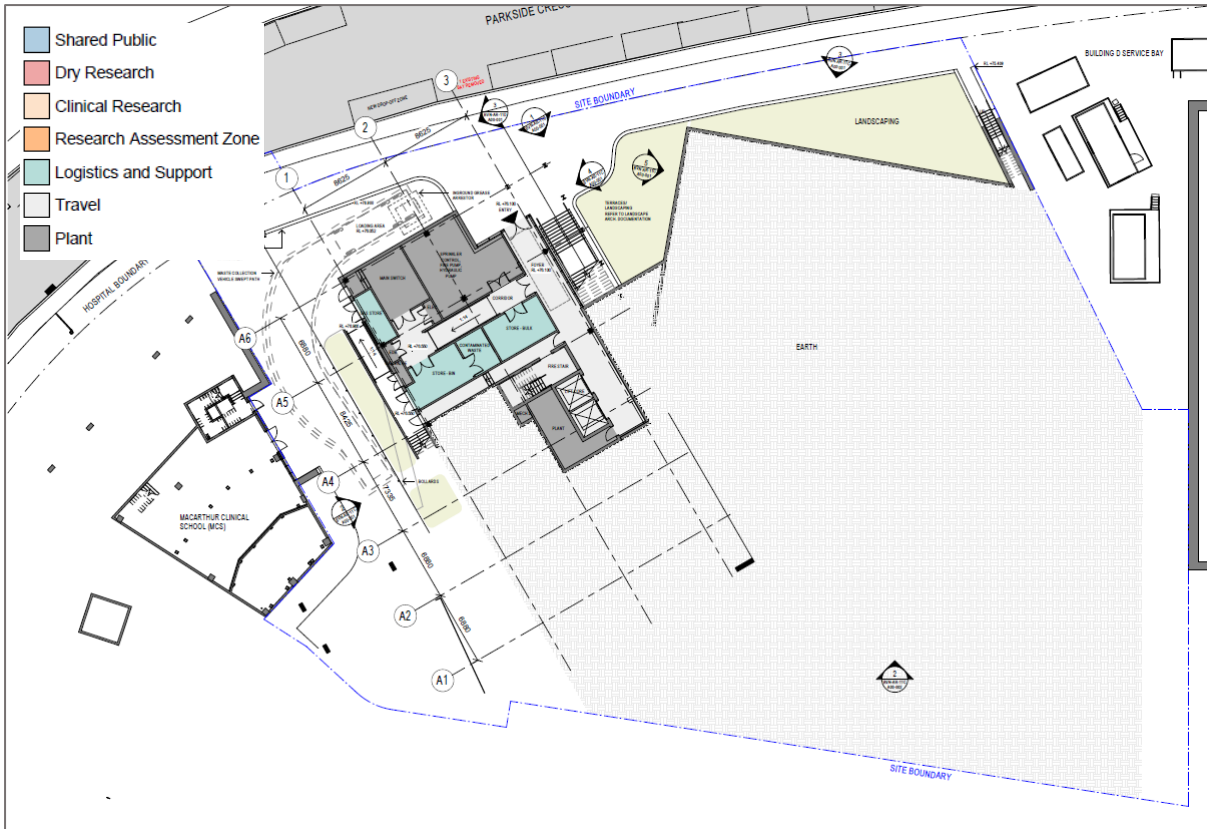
Proposed lower ground level 02 plan. Source: BVN
